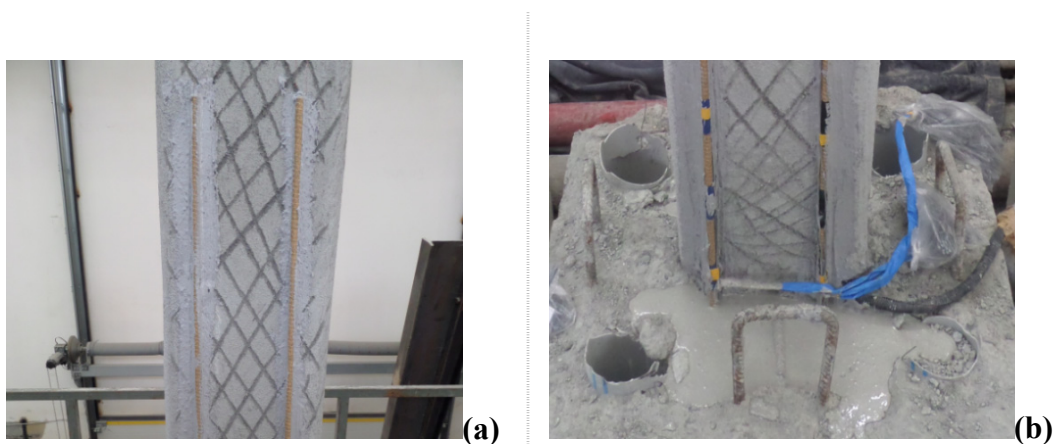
AFRP reinforcement: (a)Applied on the surface. (b)Anchored into footing.
